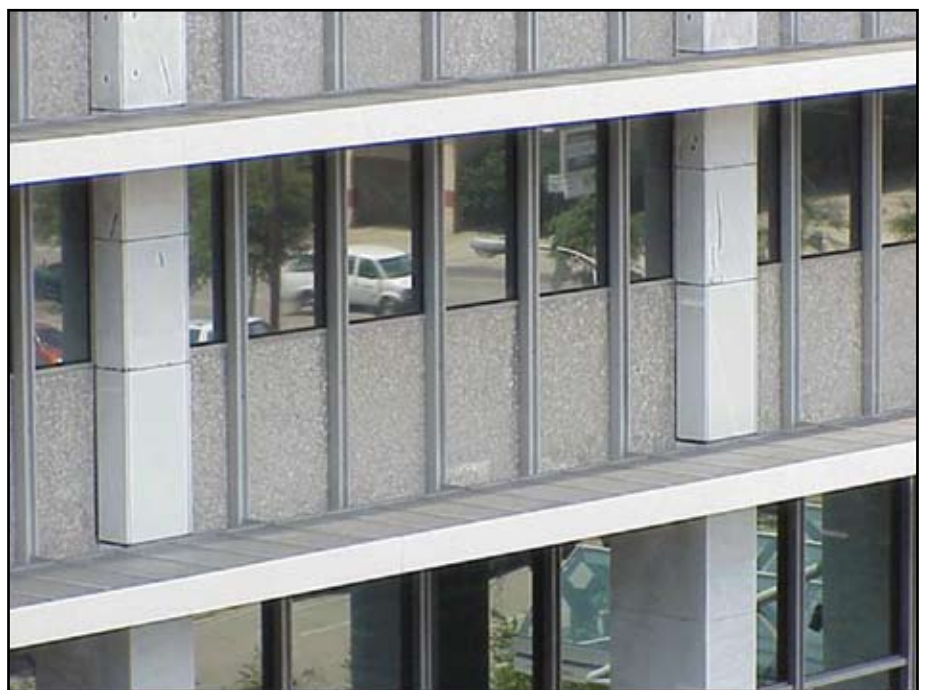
Segment of high rise building with marble clad columns exposed to weather.
